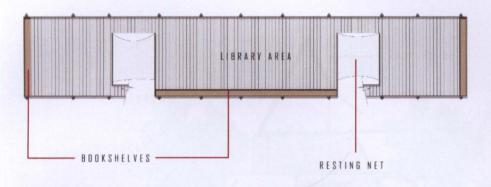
Educational centre (Vocational workshop) floor plan -Third floor
